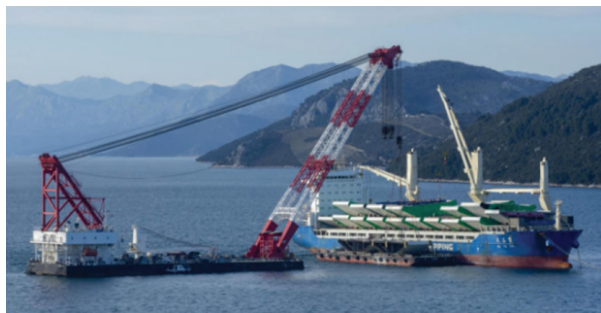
Unloading of steel box girders from heavy lift vessel (March 2020) Credit: CRBC
